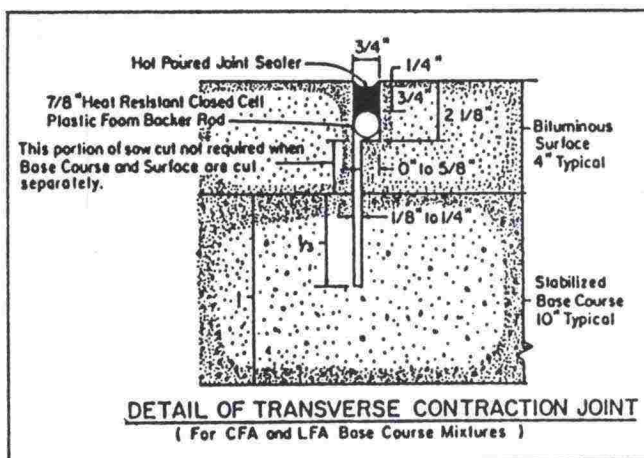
Transverse contraction joints of mixed structures in an American design specification /57/
